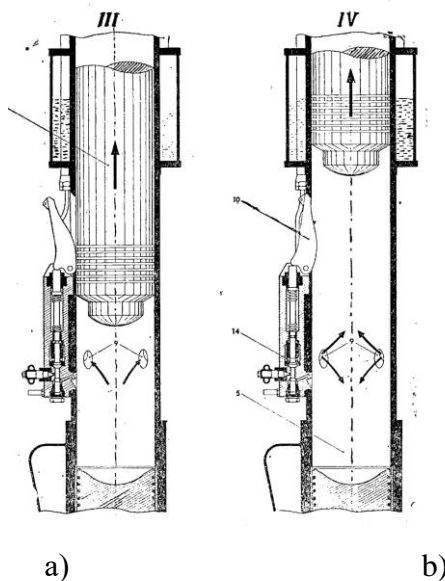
Cycle of the tube double acting diesel hammer for driving piles:
